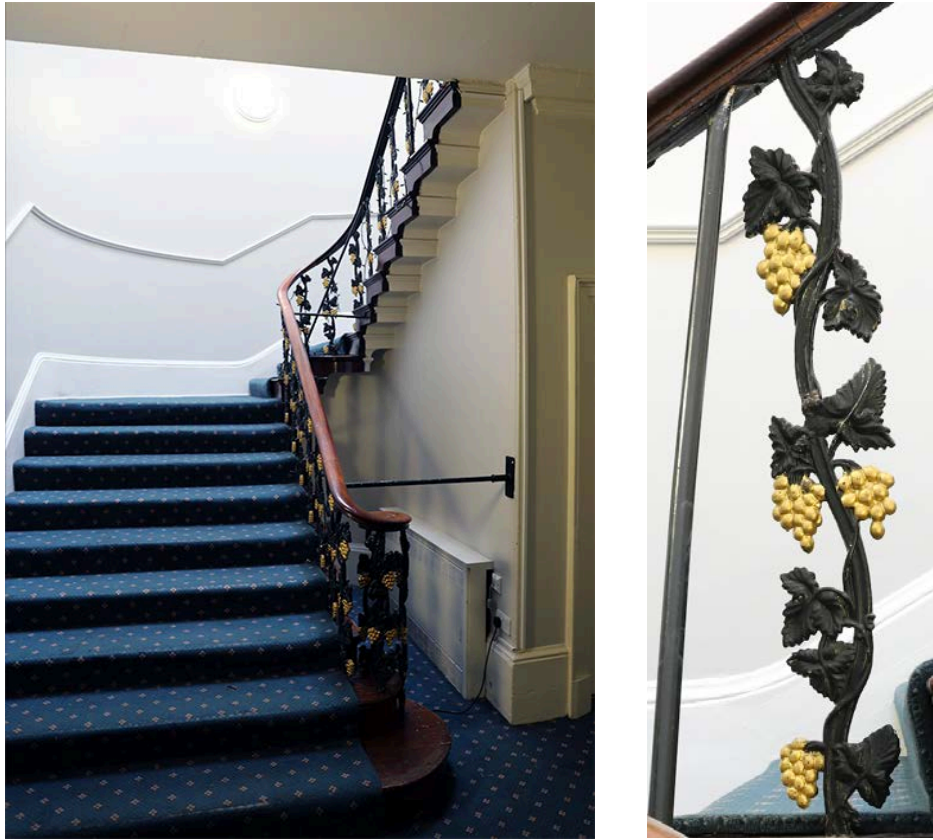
Principal Staircase with detail of the cast-iron vine balusters and later bracing rods.
